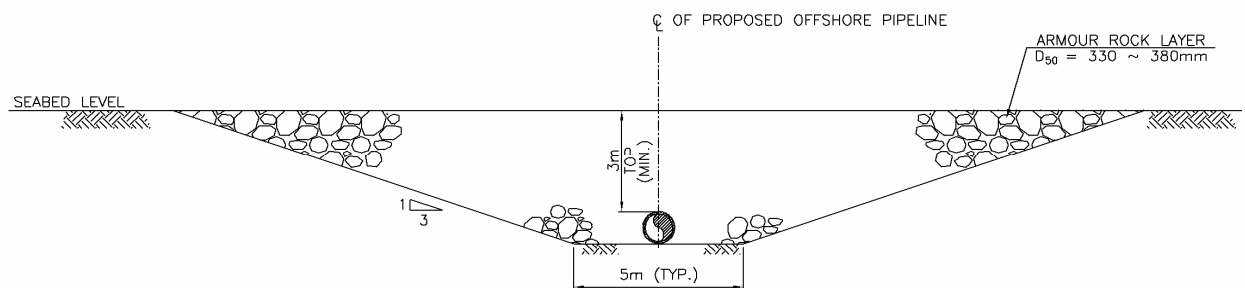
Rock Armour Protection Design for 19-tonne Anchor in Urmston Road
